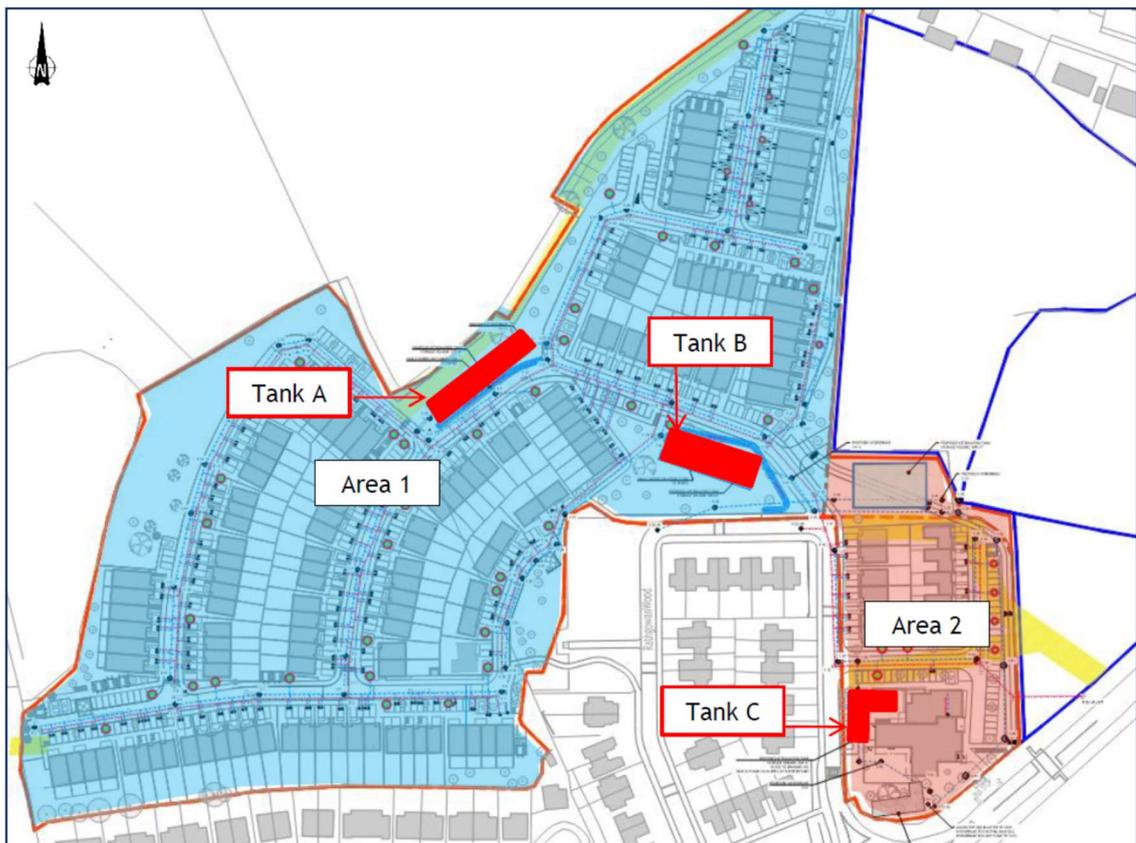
Extract from Figure 2-2 of Punch Engineering Planning Report “Proposed Drainage Areas and Tank Locations”
